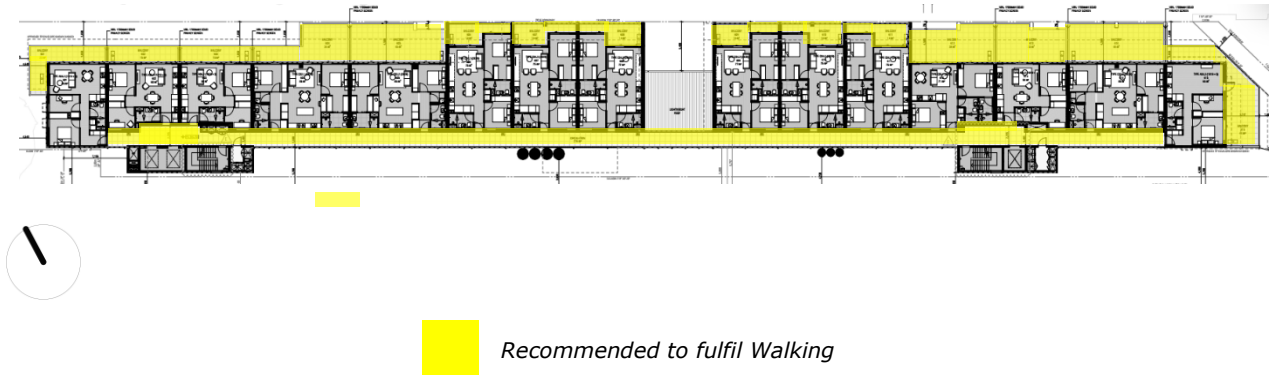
Sixth floor plan with recommended wind criteria overlaid.
